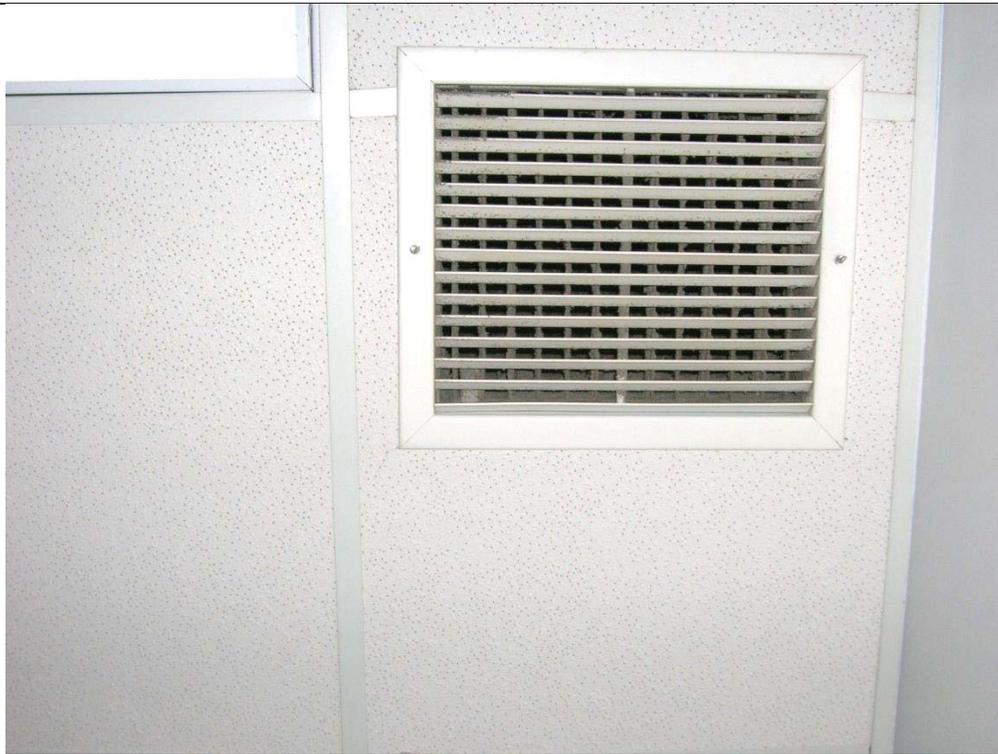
View of a return air register shown on a 2' x 2' ceiling tile layout.
